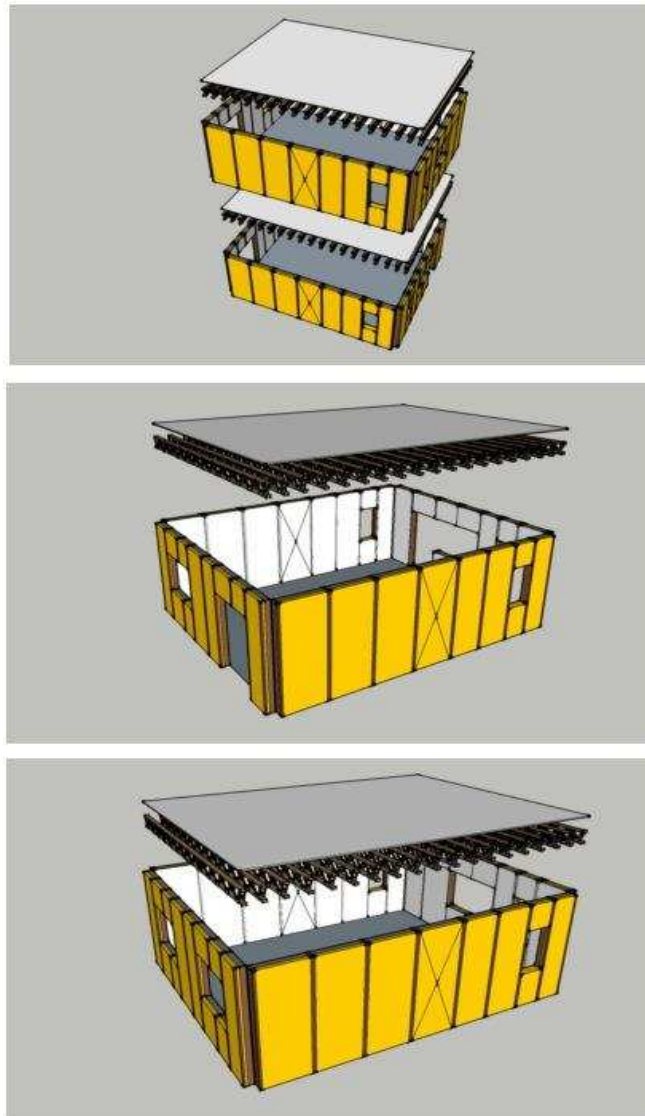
'Panelised Wall System', Chameleon House. (Image: D.Morton)
